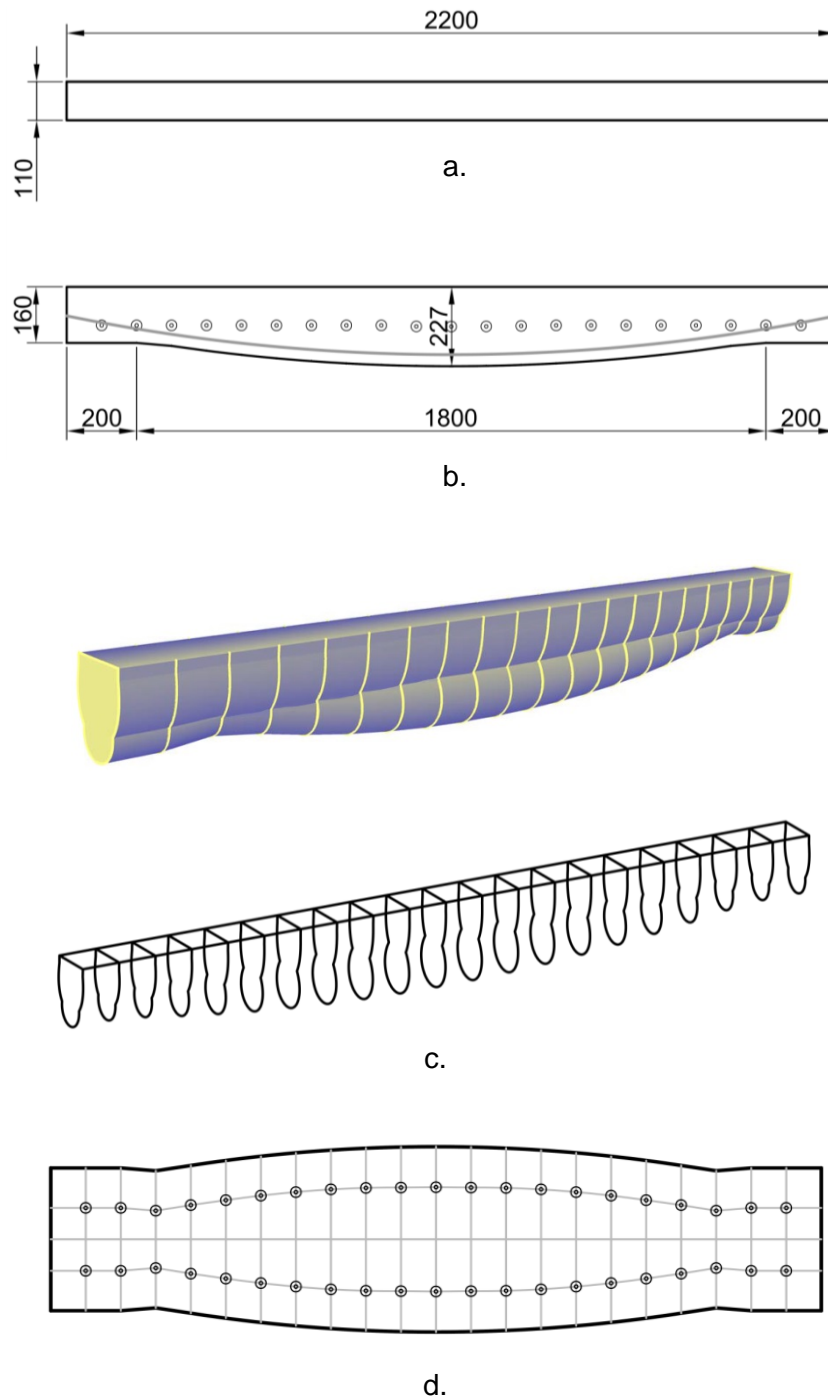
Case study 1 geometry details: (a) plan, (b) elevation, (c) 3-D view of cross sections and (d) fabric pattern (all dimensions are in millimetres)
